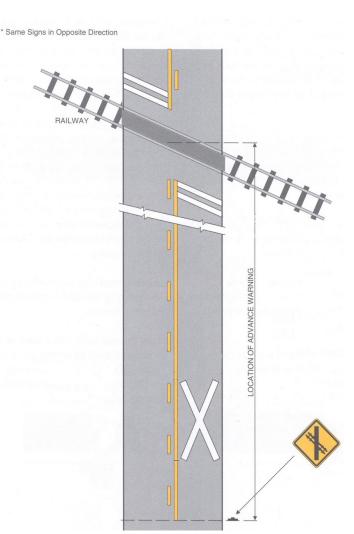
This illustrates a typical rail crossing with an advance warning sign and pavement markings.
